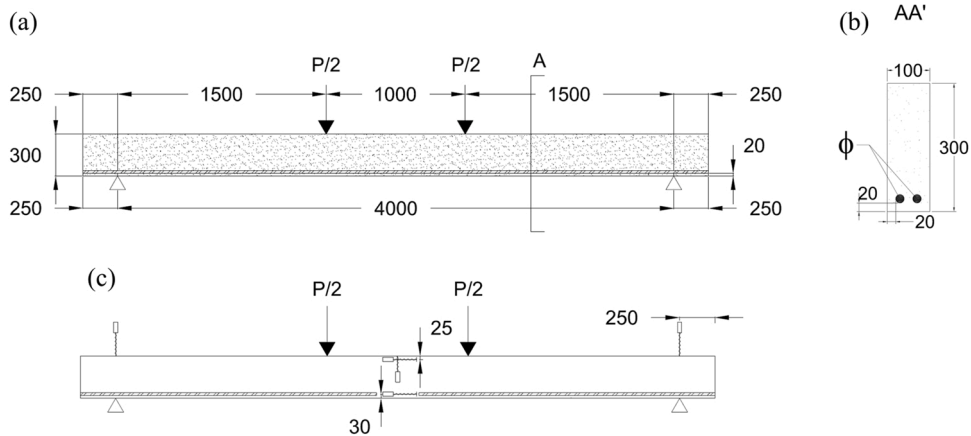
Long beams: (a) geometry (in mm), (b) reinforcement details and (c) displacement transducer's position.
